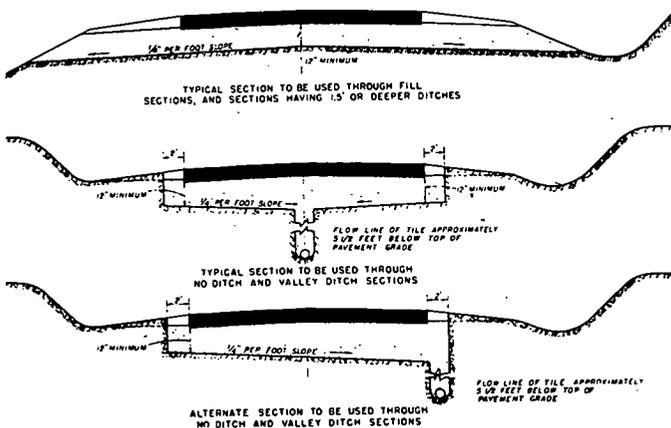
Typical Cross Sections for Sand Subbase (After Michigan Soil Manual)
